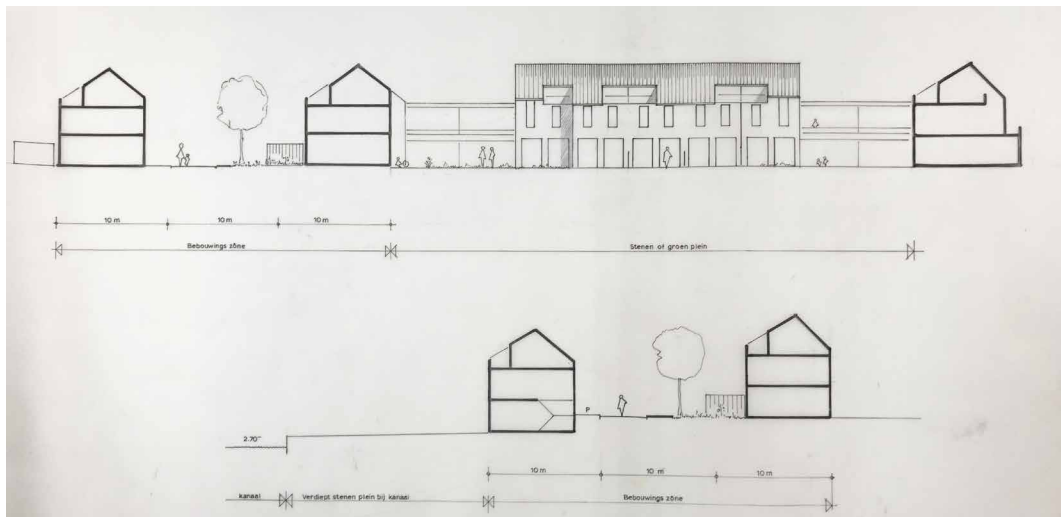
Street section and orientation, Van Stigt, De Werven, Almere Haven, HNI archive, 1977
